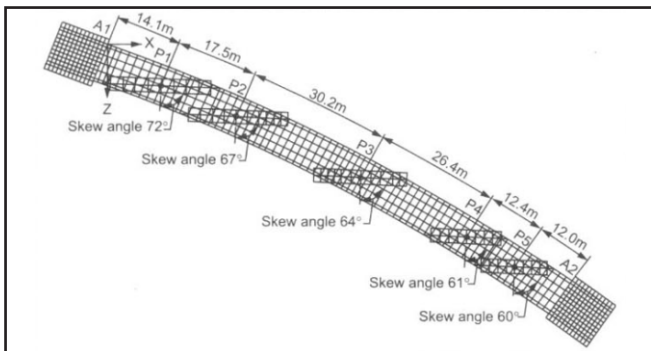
Flyover using "integral bridge" concept for Delhi Metro: Structural idealisation in plan
